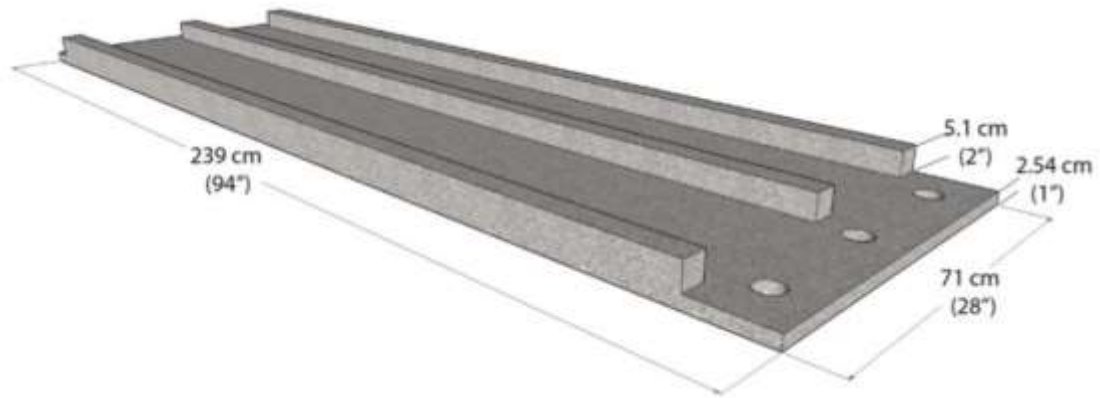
Dimensions of a ribbed concrete panel (Image source: Jensen 2016)
